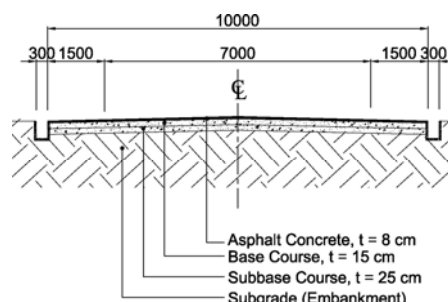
Typical Cross Section of sub-arterial road within the NR6 and the Ring Road
